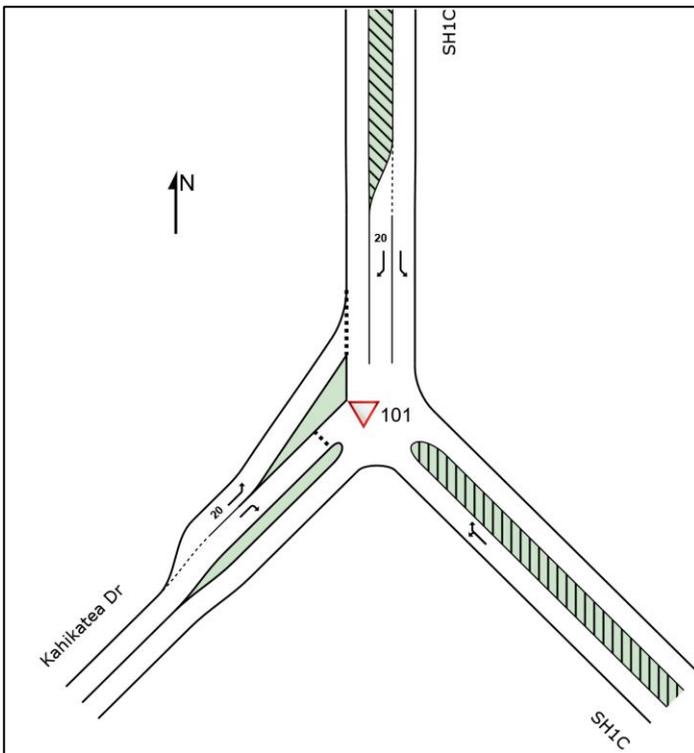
Existing SH1C / Kahikatea Dr Intersection Layout
